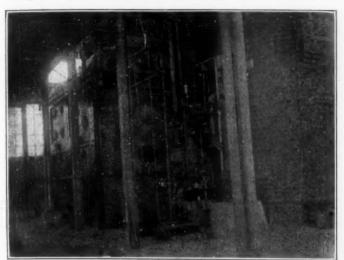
VIEW OF INSIDE OF BOILER ROOM.
